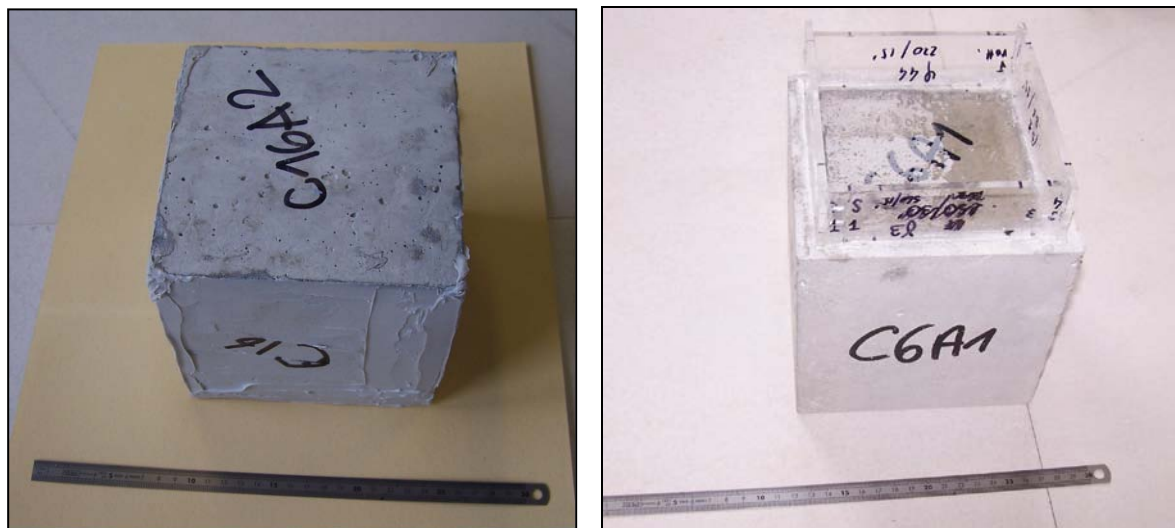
Specimen of type 3 without rebar a) specimen for immersion and b) specimen for ponding.
